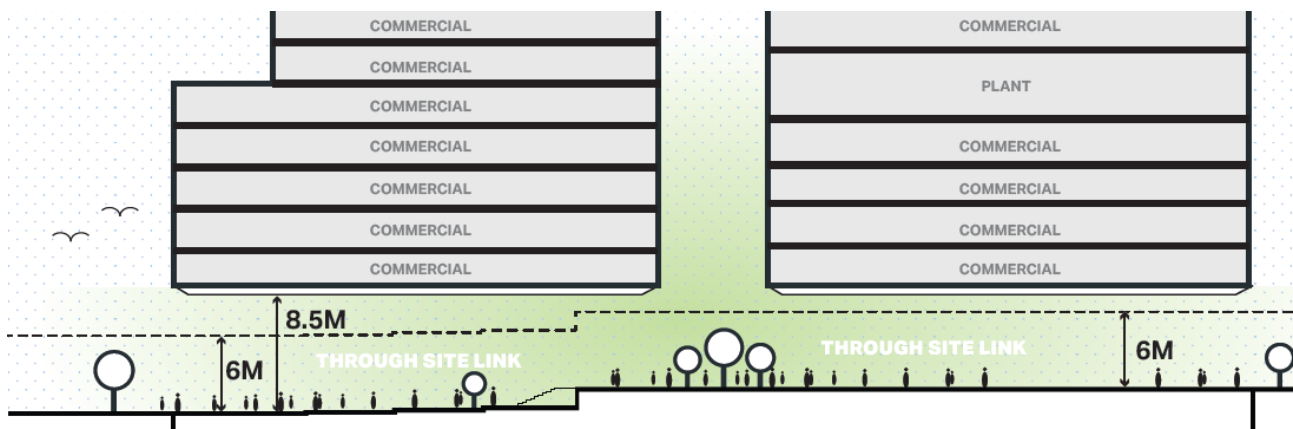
XX 133-145 Castlereagh Street, Sydney – typical through site link cross section
